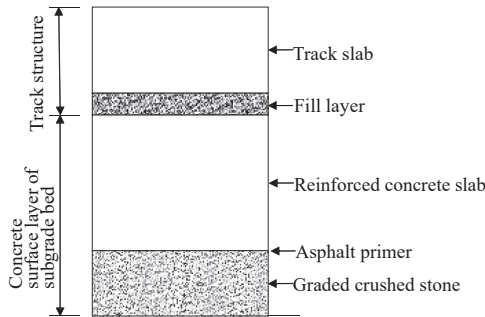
Longitudinal section structure of concrete surface layer of subgrade bed for ballastless tracks in Japan
